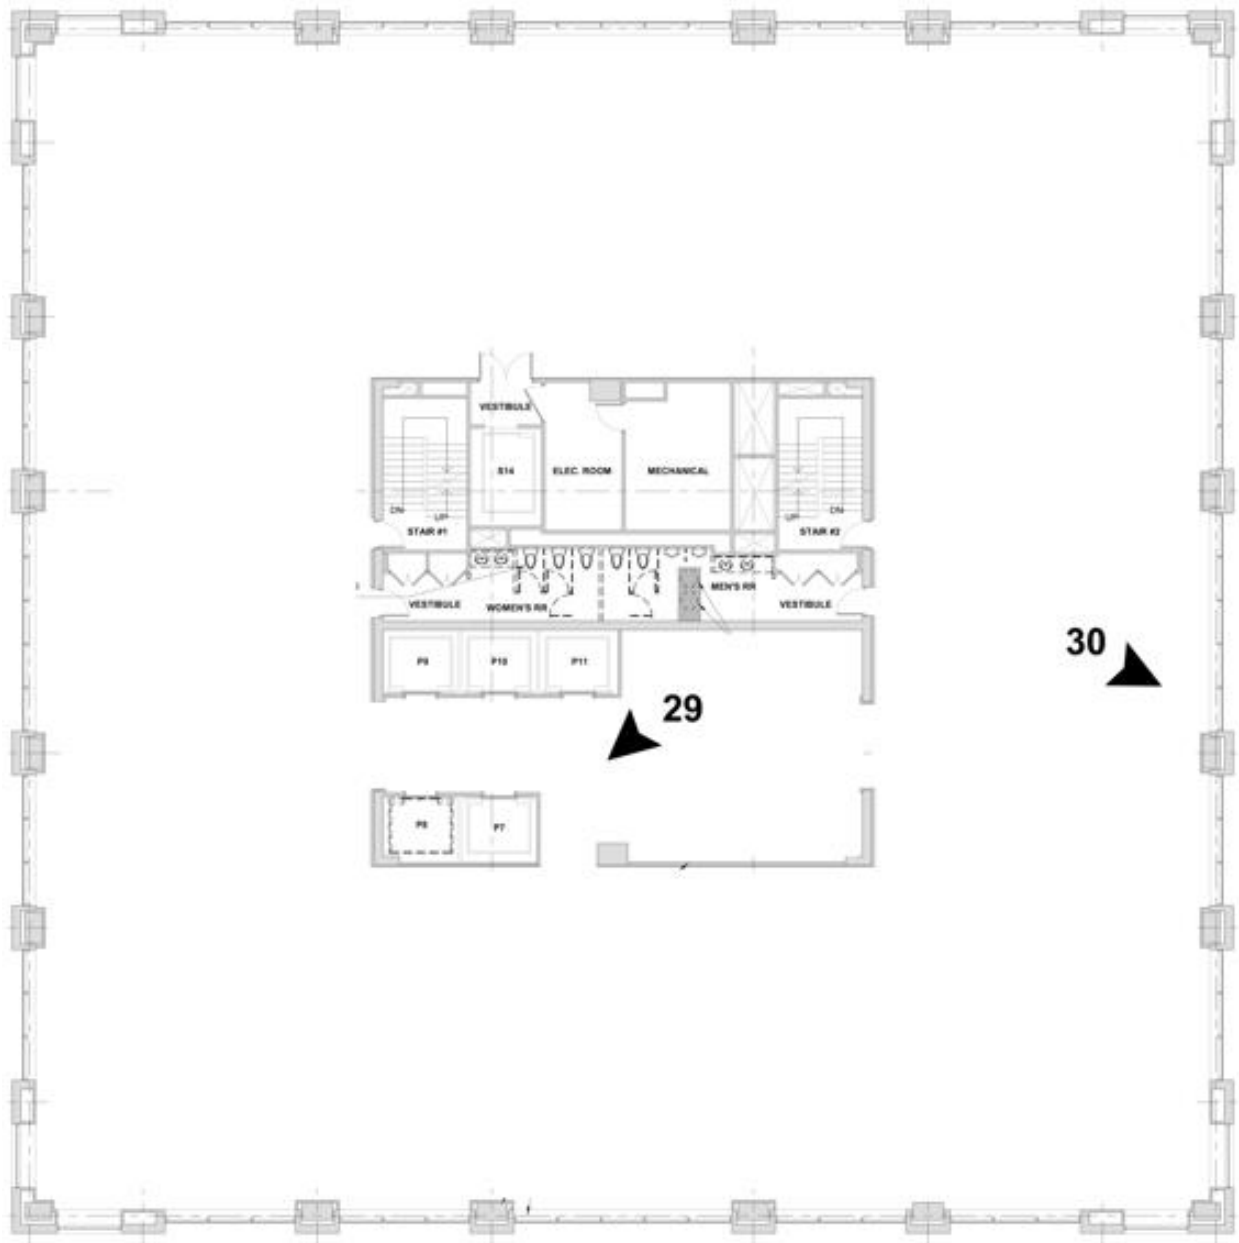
Tenth floor & photo plan. Base plan from SCB Architects, 2024.
